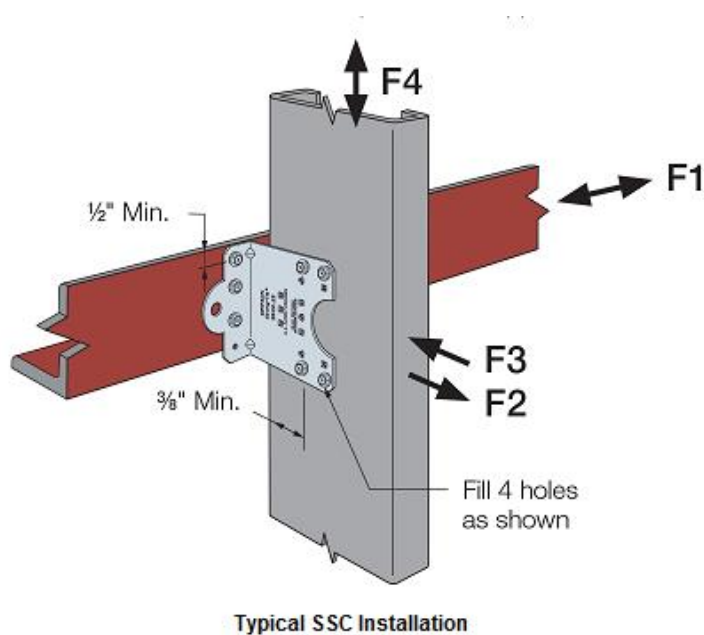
B—SSC BYPASS FIXED-CLIP APPLICATION AND INSTALLATION DETAILS
